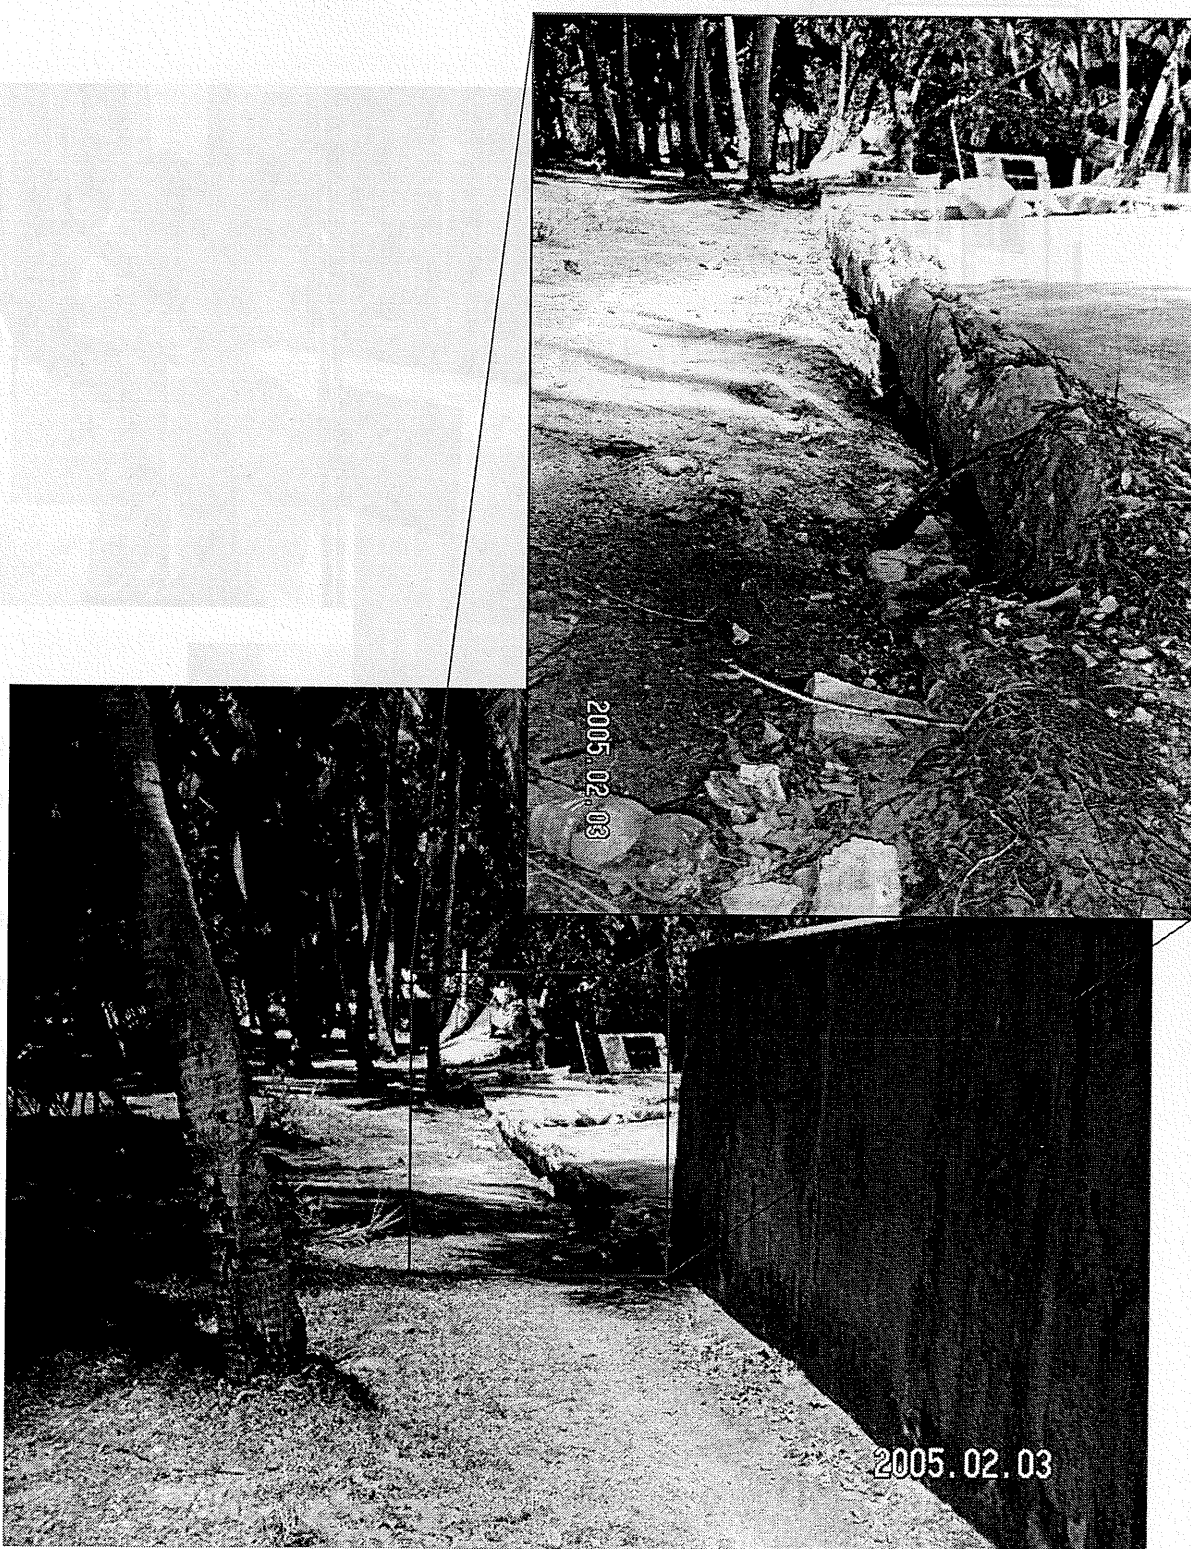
Collapsed Wall at North West Part of the Is. Kulhudhuffushi
